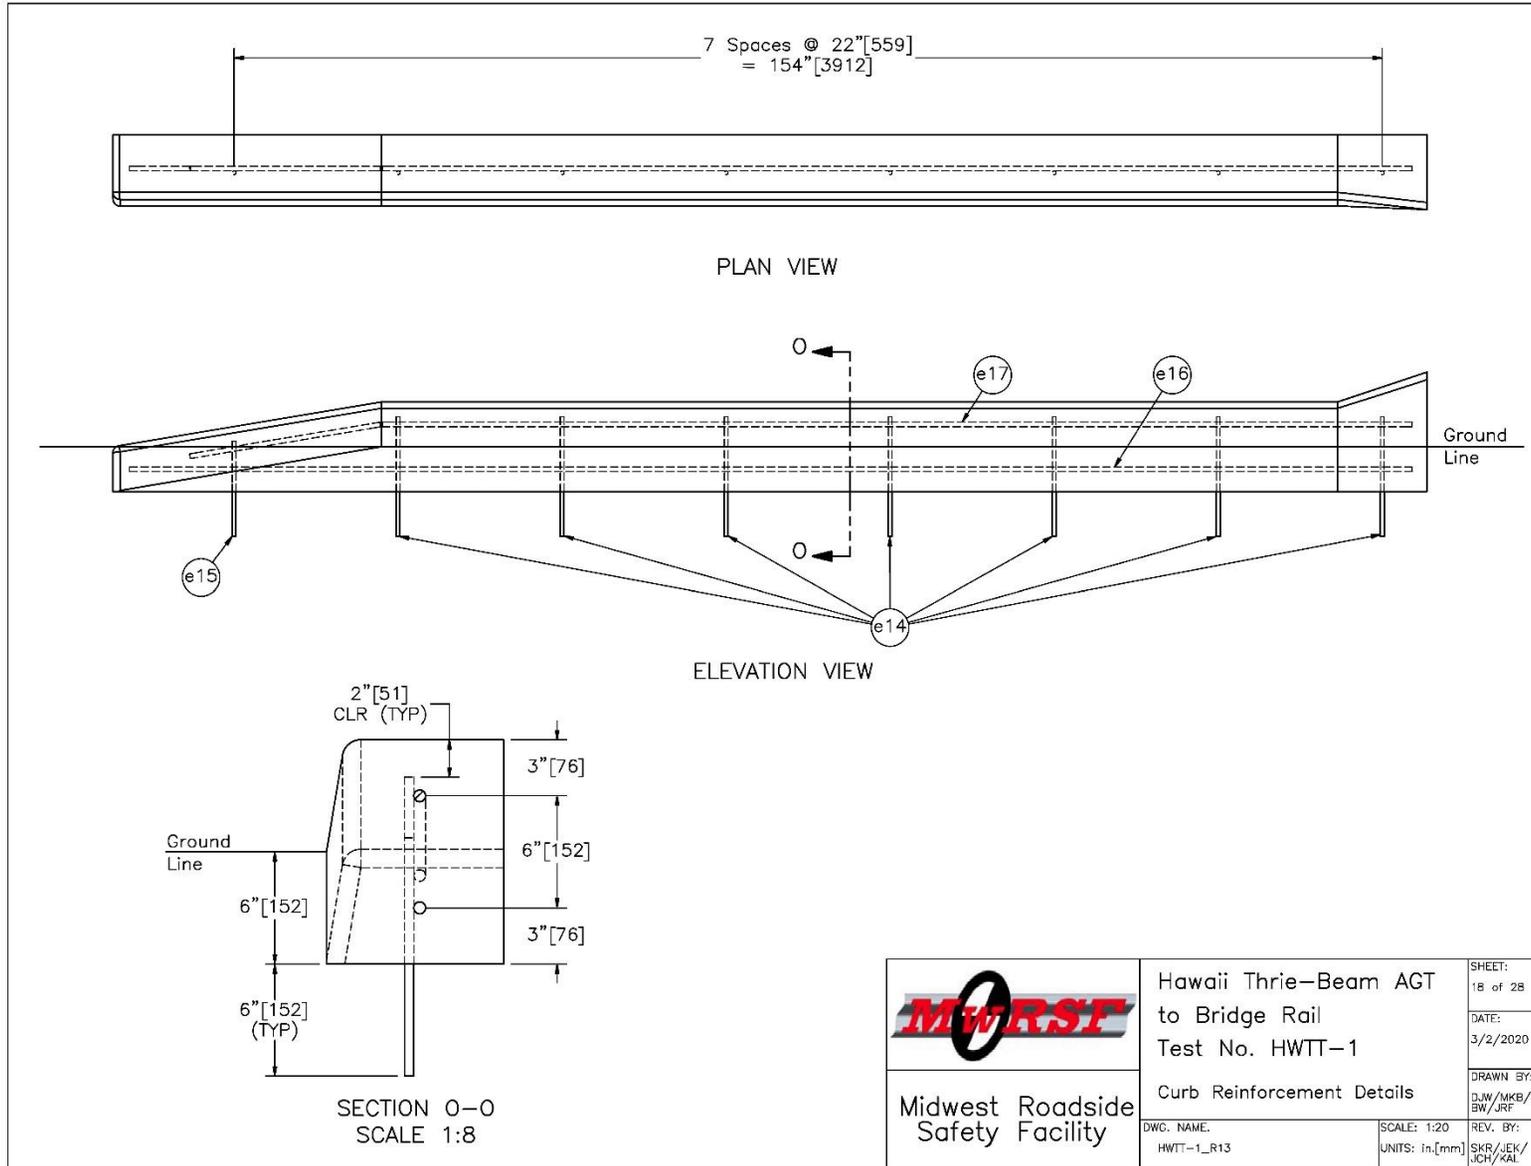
Curb Reinforcement Details, Test Nos. HWTT-1 and HWTT-2
